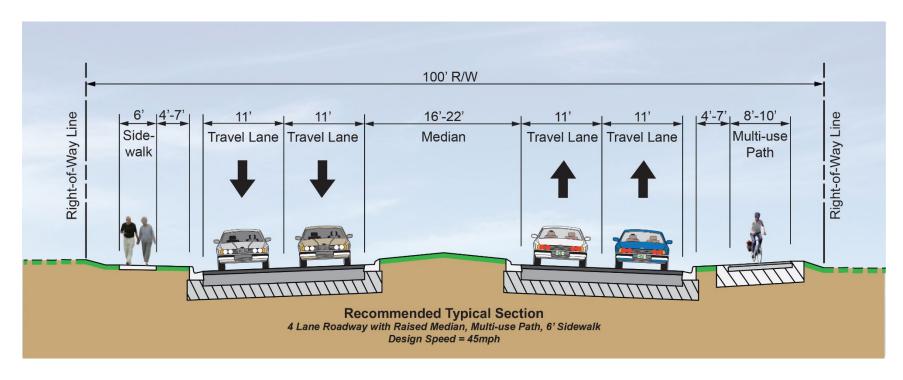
Recommended Typical Section (Refined Typical Section No. 2)
